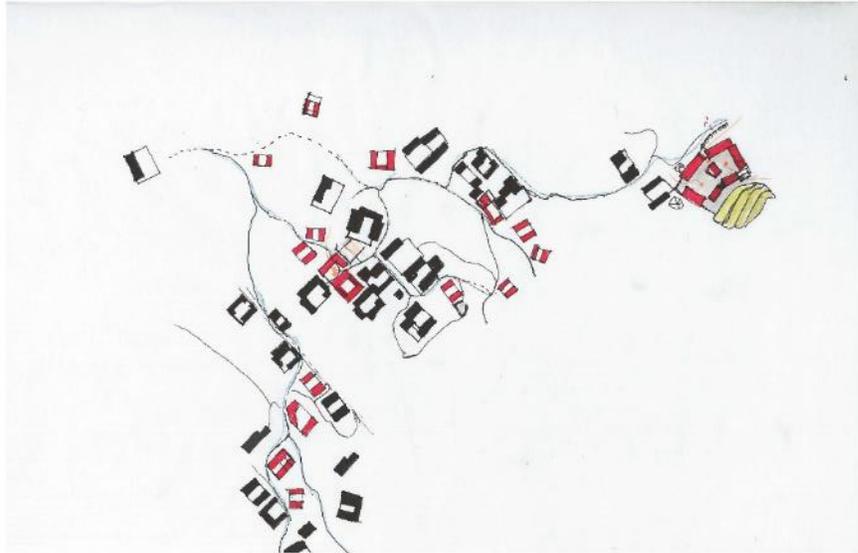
Proposed sparse layout with red indicating future proposed buildings
